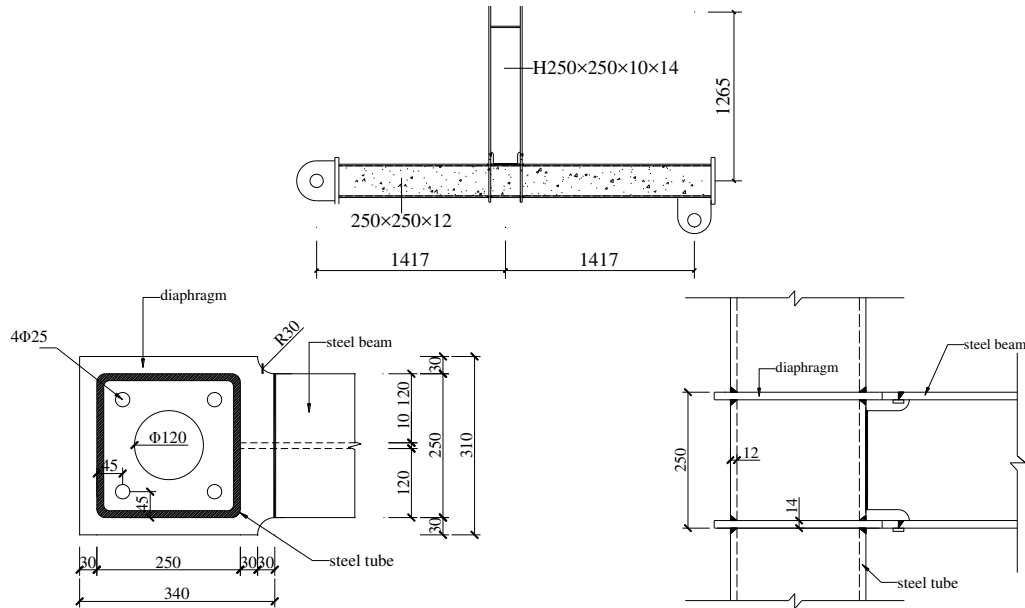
Details of the T-shaped diaphragm-through connection: T-shaped specimen (top), overhead view (left), and section view (right).
